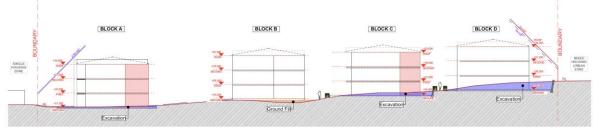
Sample Elevations – West – [Brewer Davidson]
